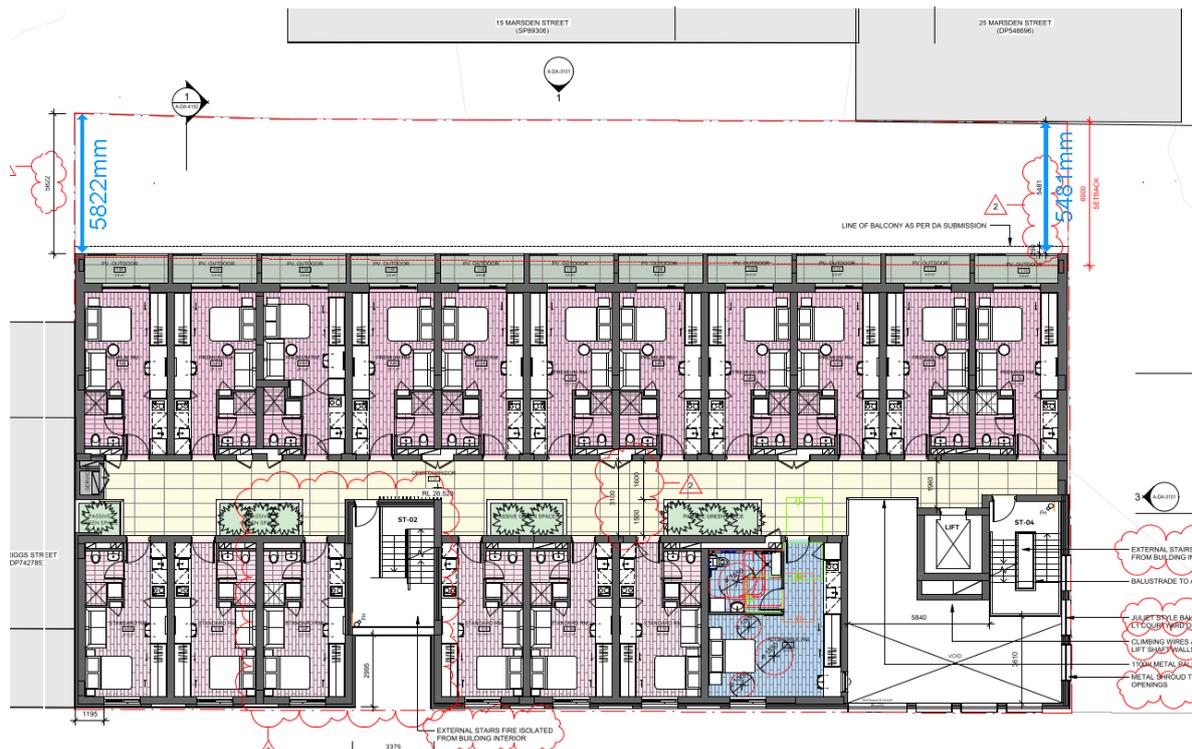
Rear building separation from boundary excerpted from level 1 plan
